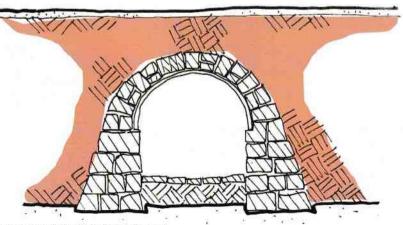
Large culvert - masonry arch with corrugated iron formwork
